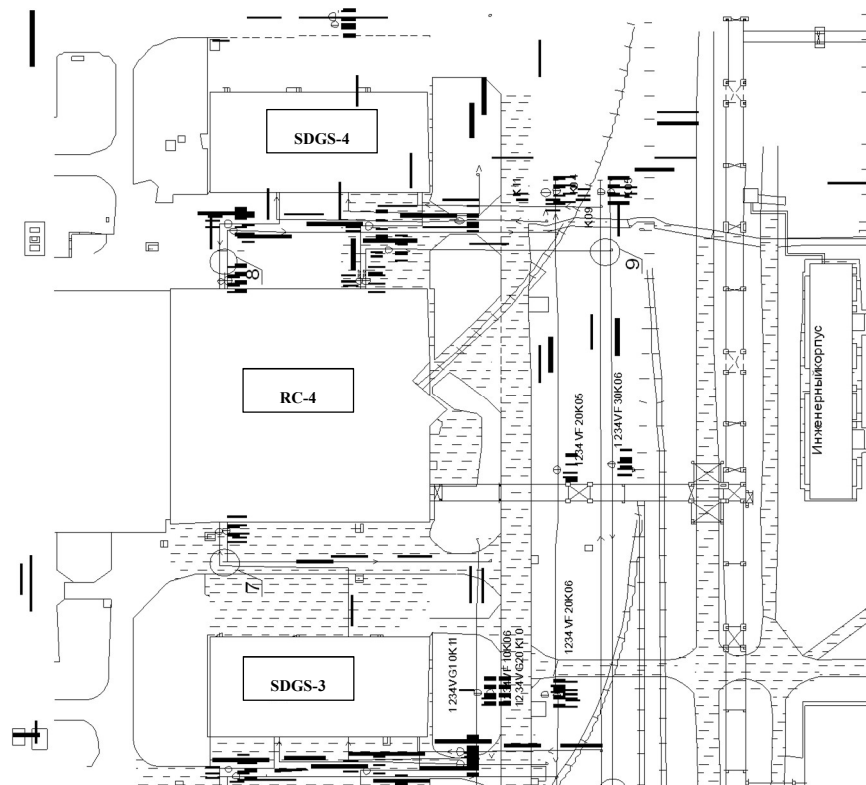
Layout of underground ESWS piping of ZNPP-4
